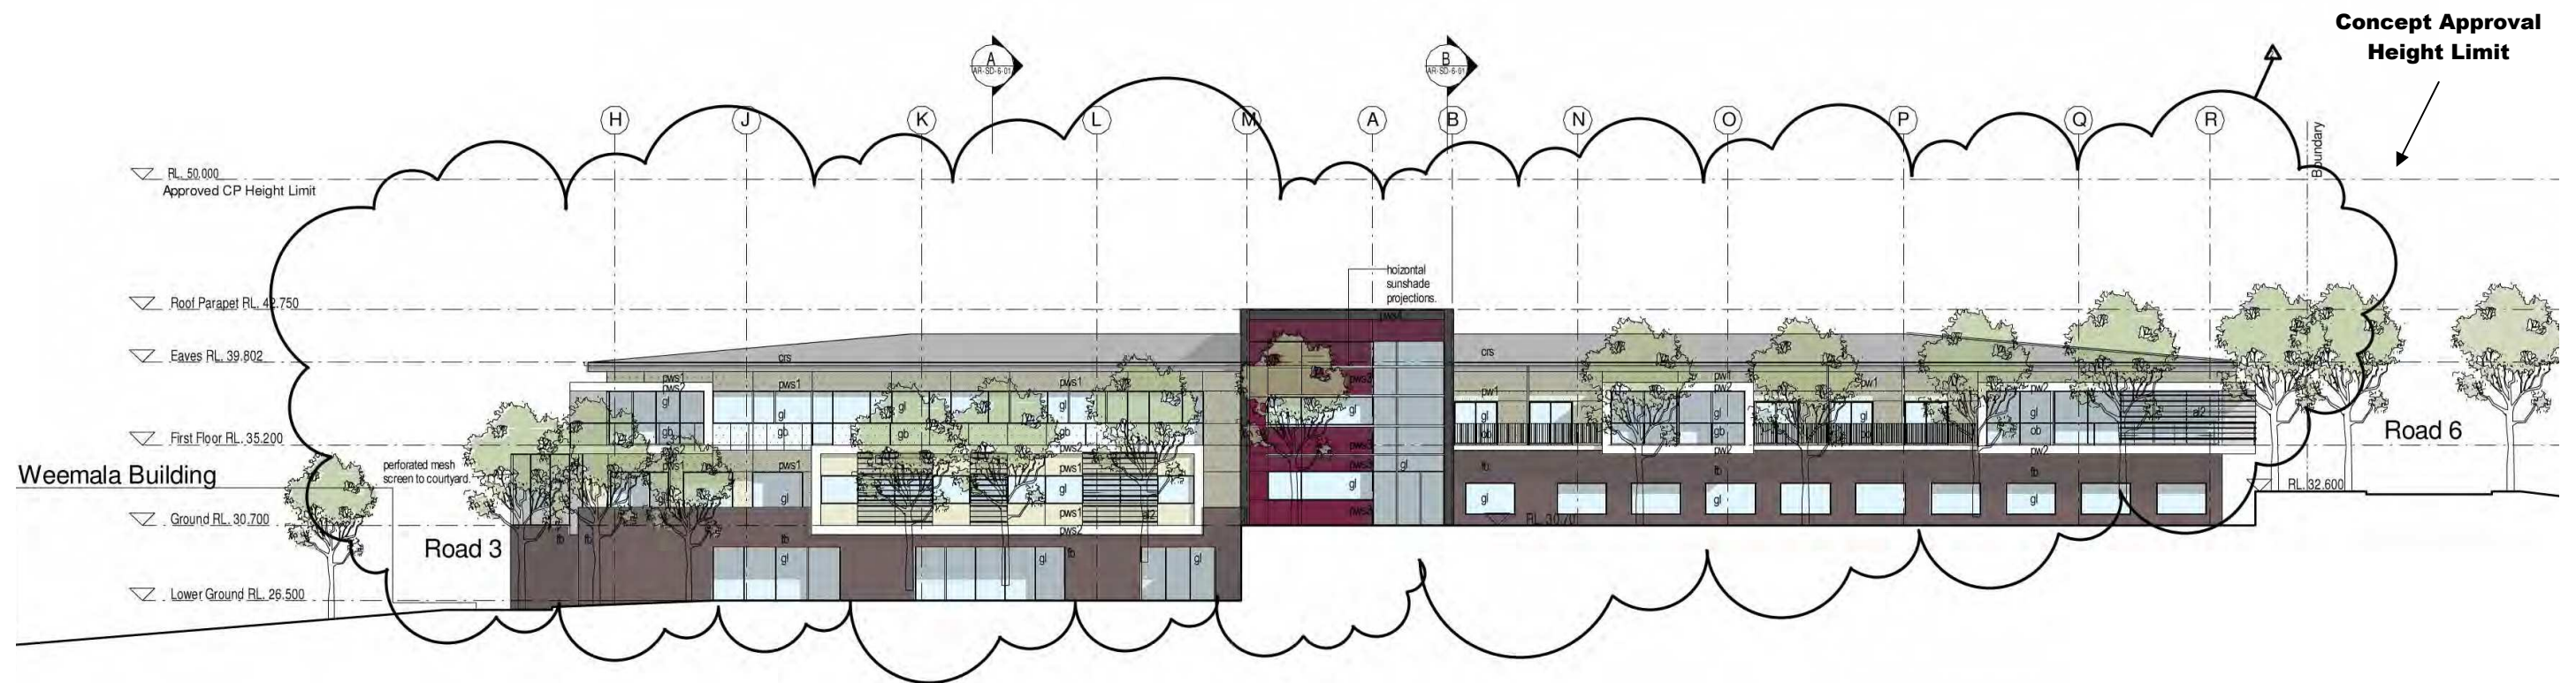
Proposed north elevation illustrating building height is below approved Concept Plan requirement as contained in the Section 75W EA
